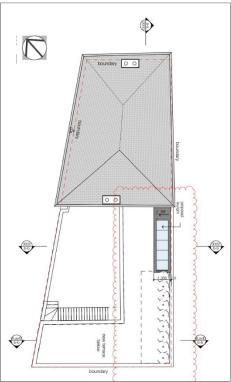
The Second floor layout and approved works and roof plan. (DA1102 (H) and DA1103 (E) provided by Think Planners Pty Ltd)
